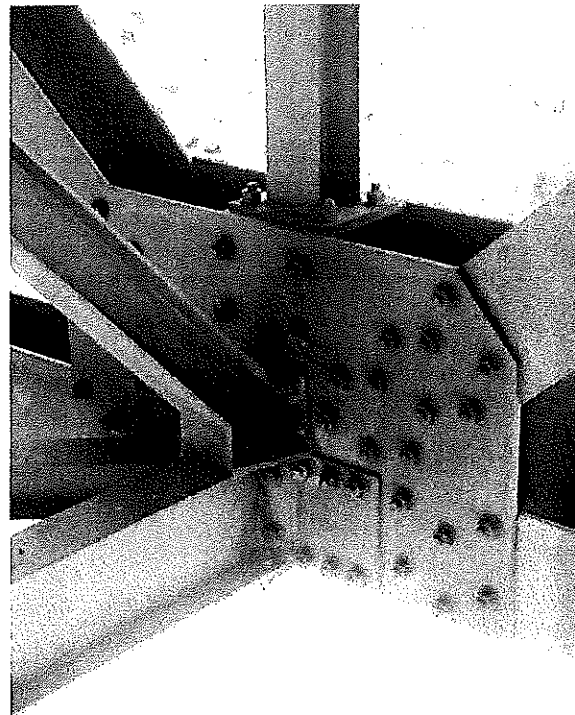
Yapei Bridge. Detail of truss lower node connection to intermediate diaphragm.
